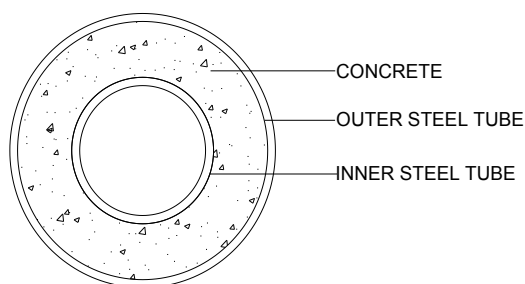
The cross section view of hollow steel Column in-filled with concrete.
